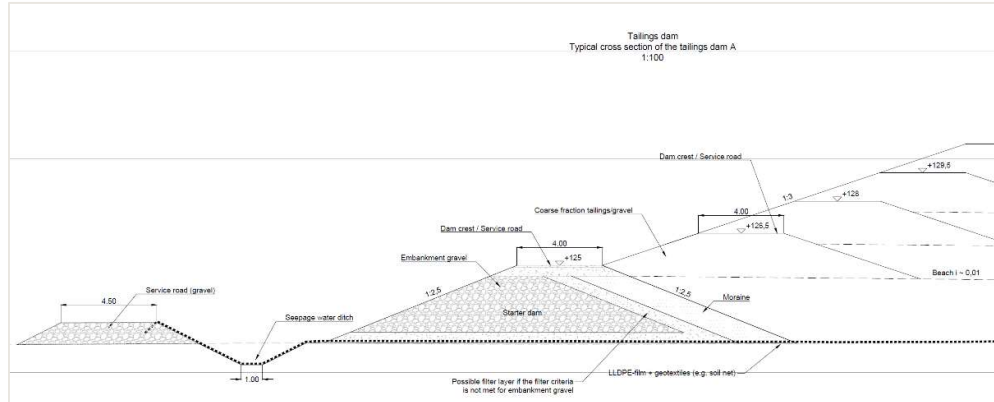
Principle of the starter dam and dam raisings (upstream).
